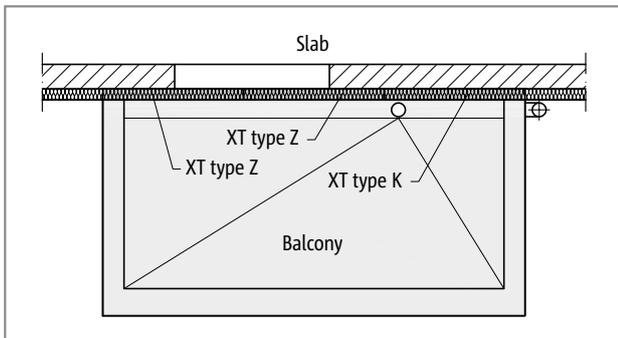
Schöck Isokorb® XT type Z, K: Block-out for drainage with Schöck Isokorb® XT type Z
